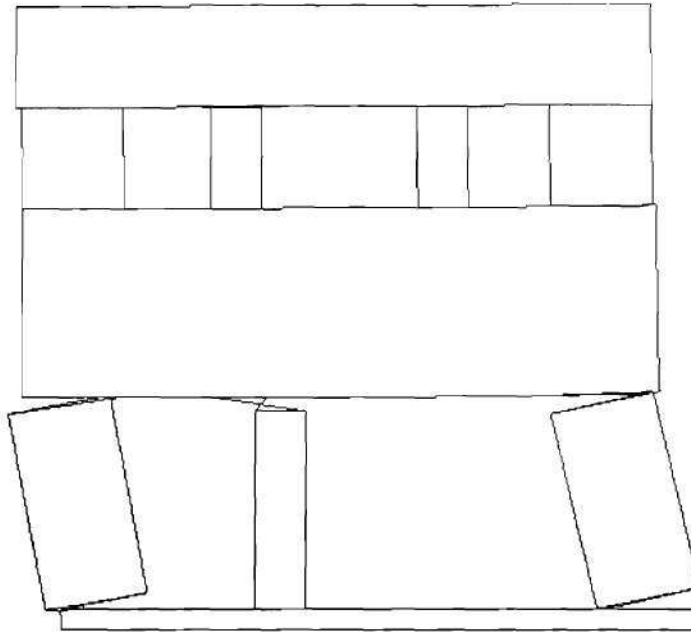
Deformed shape of Wall 2 (loaded to the left)
